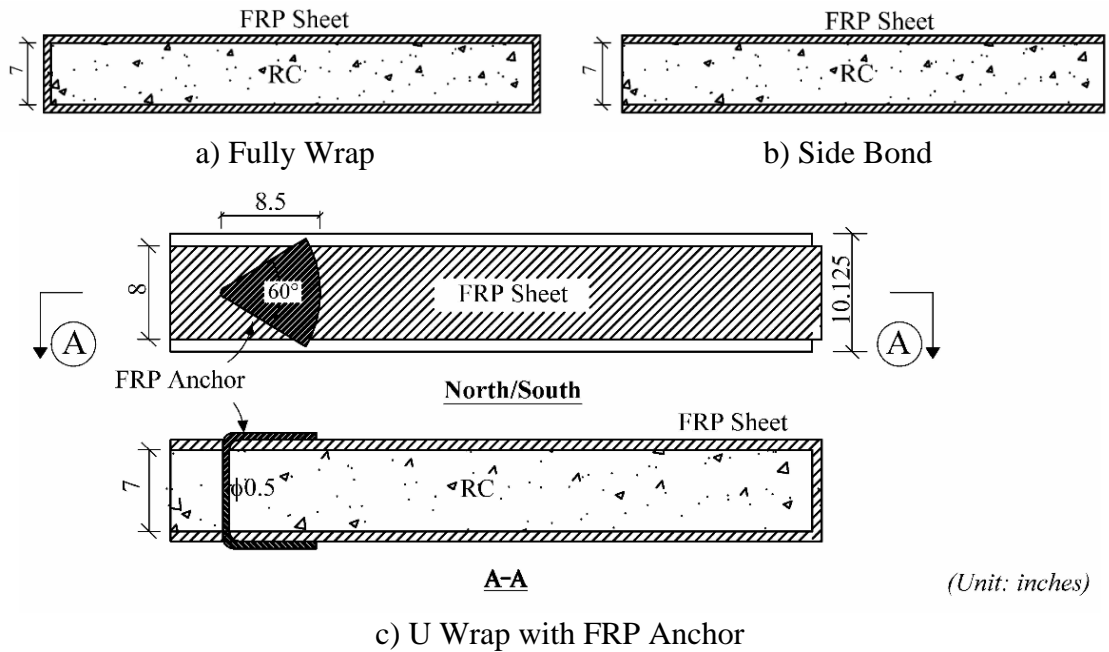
Wrapping Scheme and FRP Anchor Details
